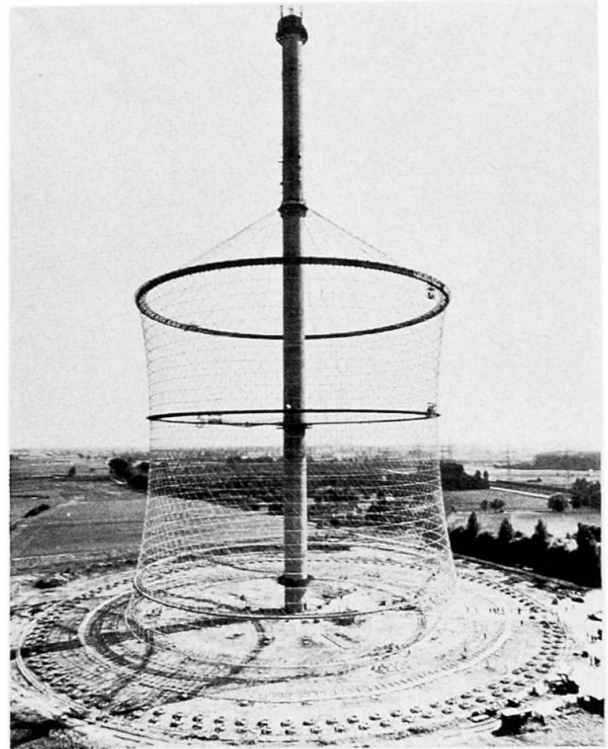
The cable-net tower for the nuclear power plant at Uentrop/Schmehausen. Completed works up to Sept. 75 (see Fig. 5, construction phase 2).
